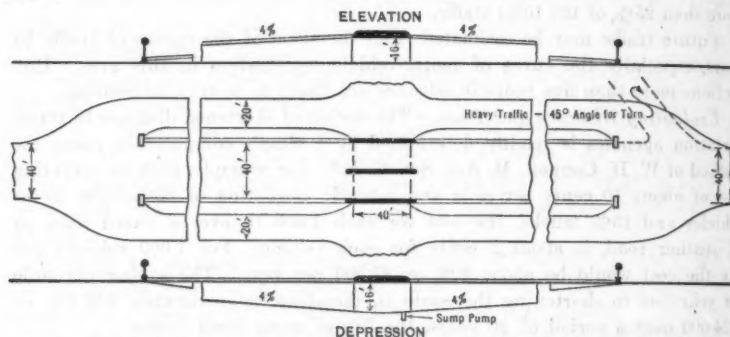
PLAN FOR HIGHWAY GRADE SEPARATION ON LEVEL GROUND BY EITHER ELEVATION OR DEPRESSION OF ONE ROADWAY.
